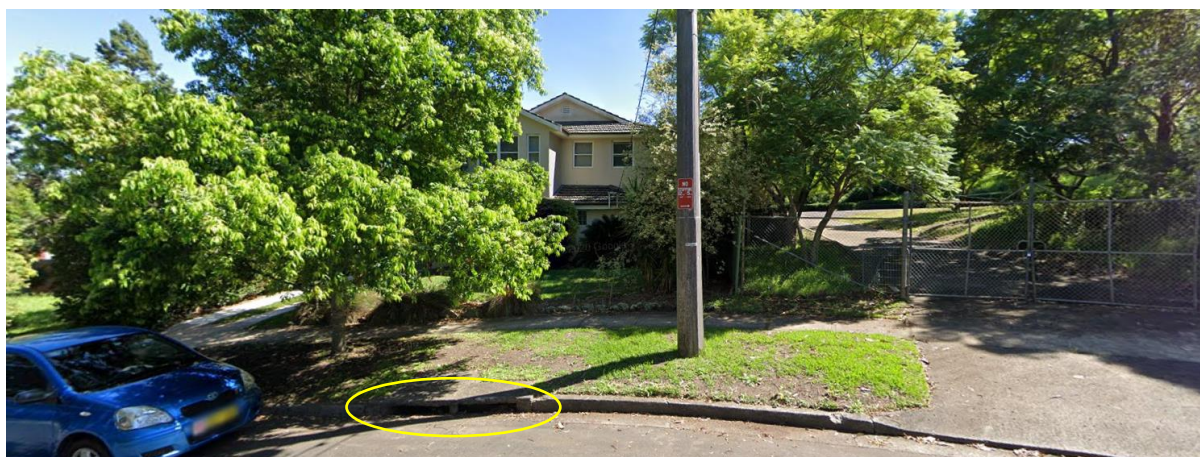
Thelma Street – showing stormwater pit near the entrance to the site
